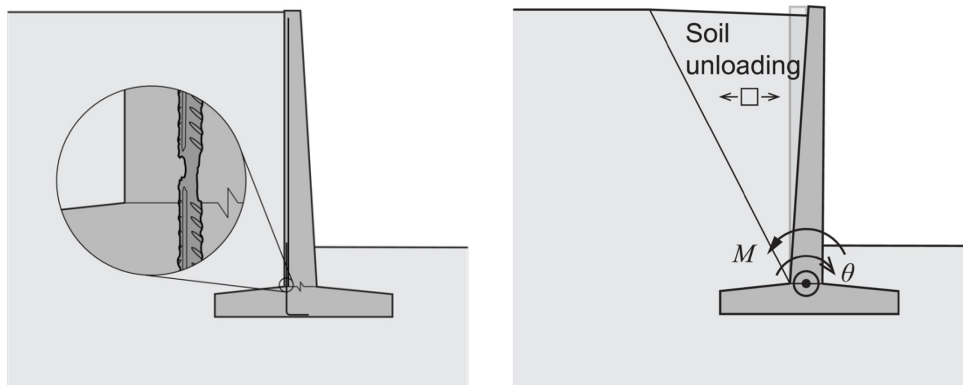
On the left: cross-section of a corrosion-damaged cantilever retaining wall. As observed in [1], the corrosion is localised at the construction joint. On the right: corrosion-induced soil unloading.
